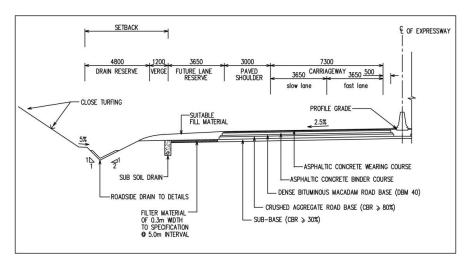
Pavement cross section at KM23.70 to KM24.10 Eastbound.
